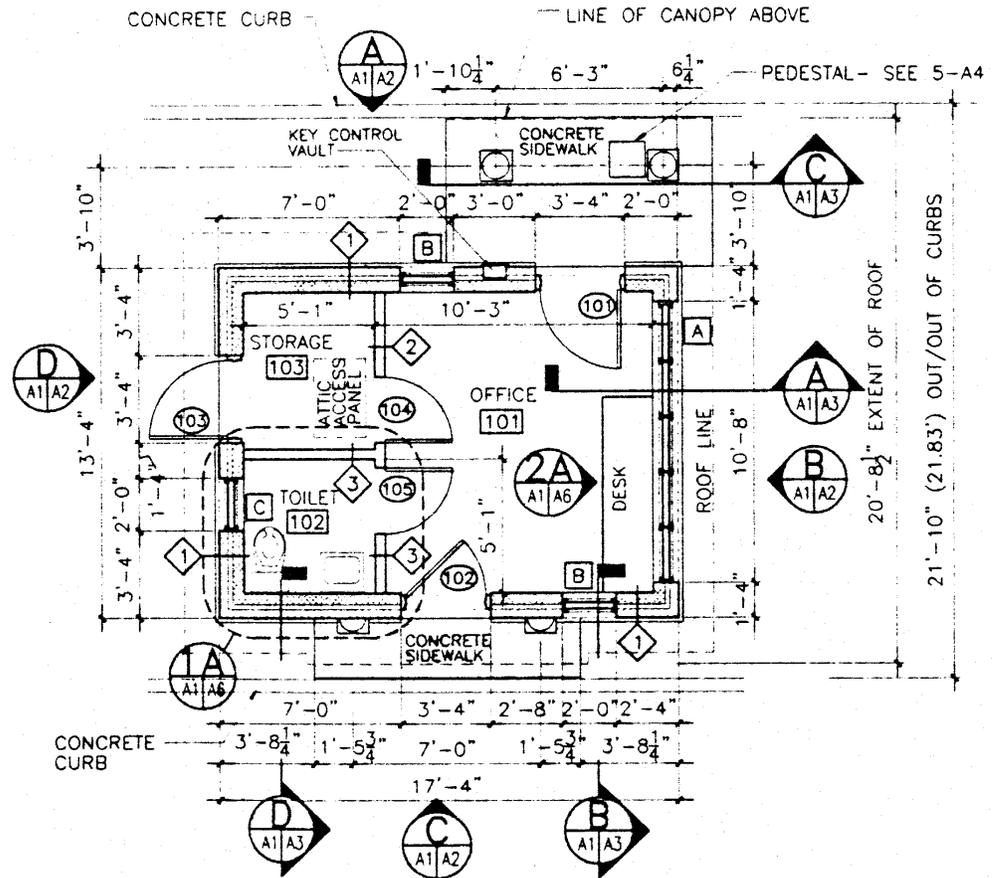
Proposed Gatehouse plan for the Main Gate
